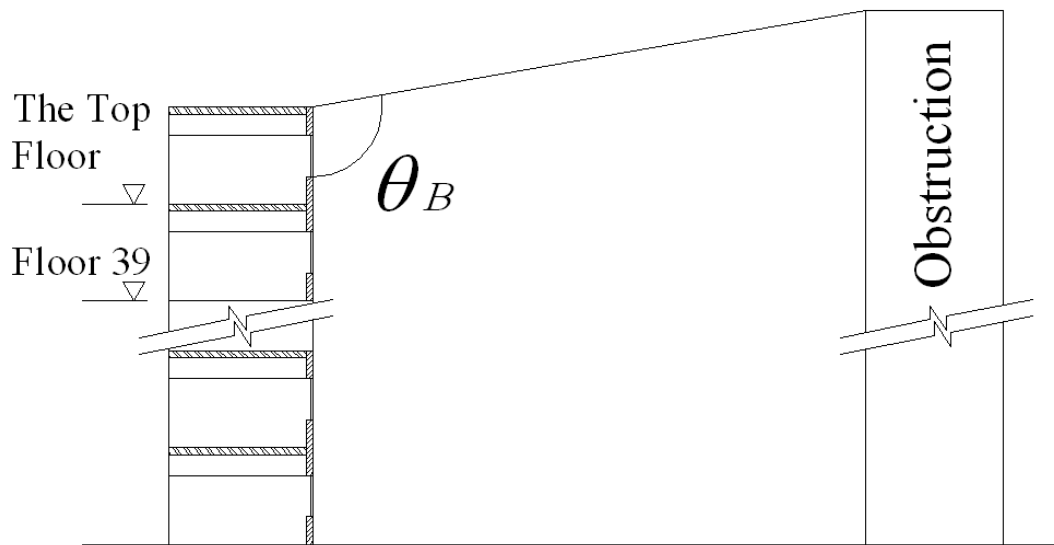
The angle between the façade of the reference building and the roof of the obstructing building, with the intersection of the roof and façade of the reference building as origin (θ_B)
